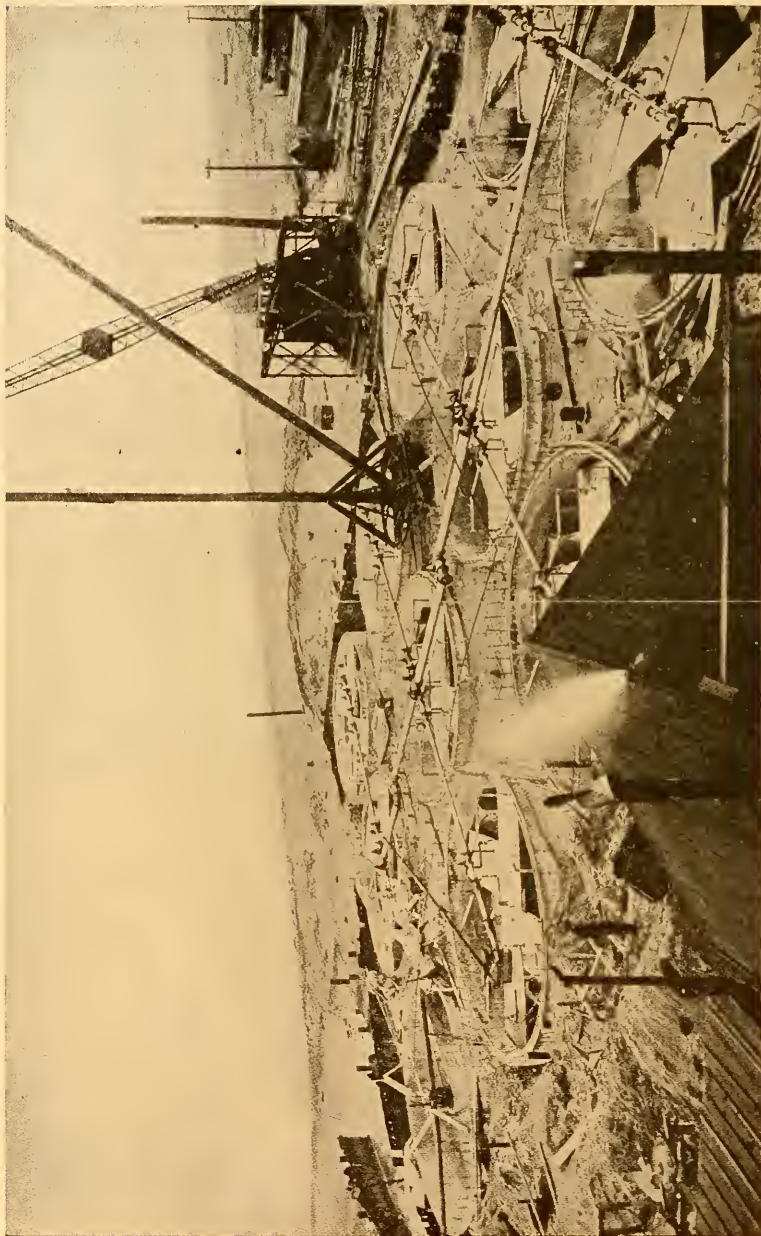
Jones Island Activated Sludge Plant at Milwaukee when nearing completion.
